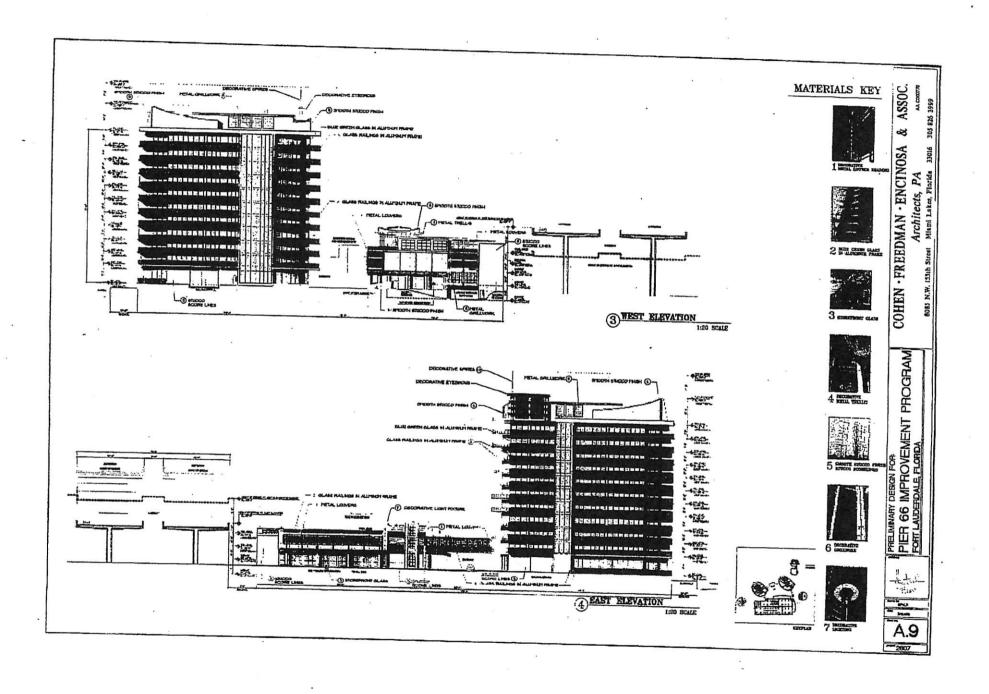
Second Amendment to Previously Approved Site Plan (Case No. R15043)
